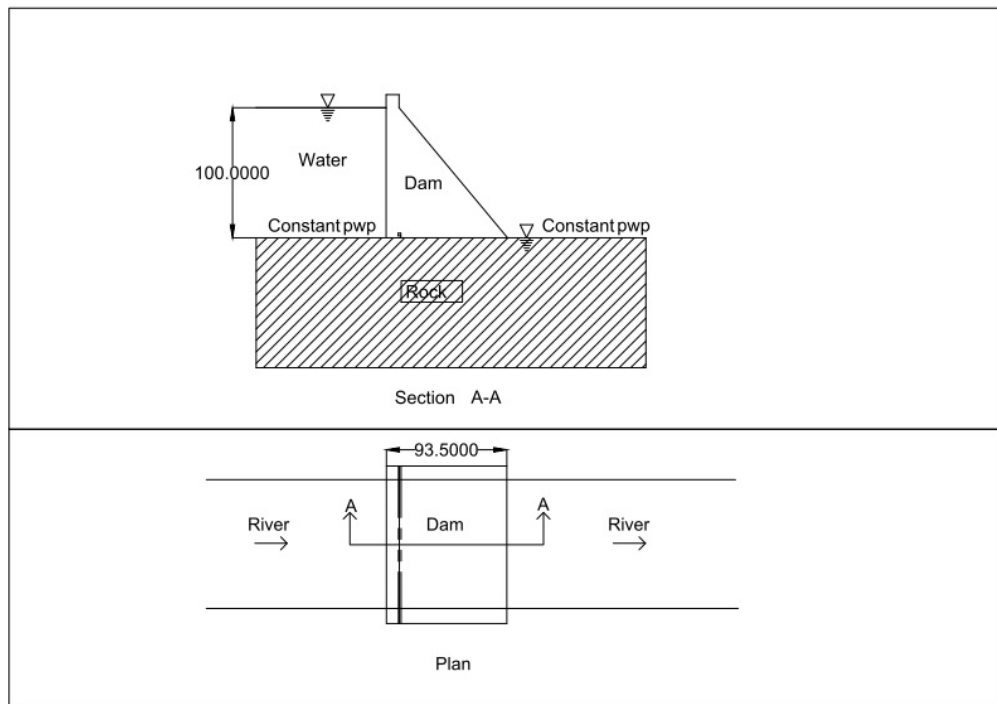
Plan and section of the formulated problem(dimensions in metre)
